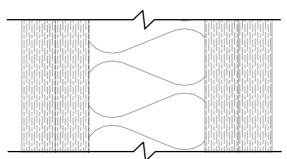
Wood Wall constituted by: 2 x Plasterboard (1,3 cm) | Glass wool (4,5 cm) | 2 x Plasterboard (1,3 cm).
